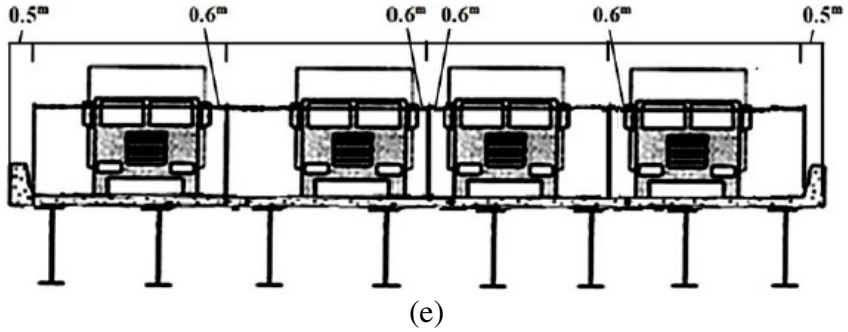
Live loading cases for four-lane bridge configurations for: (a) Exterior girder one-partial load (b) Exterior girder two-partial load (c) Exterior girder-full load (d) Interior girder two-partial load, and (e) Interior girder-full load
